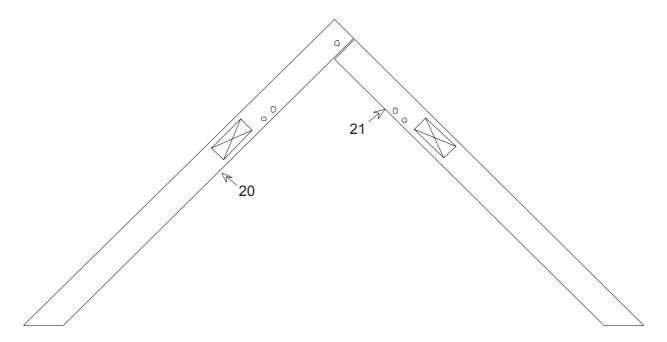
Upper cross-wing, truss 1 view to south. Location of samples 1-3
